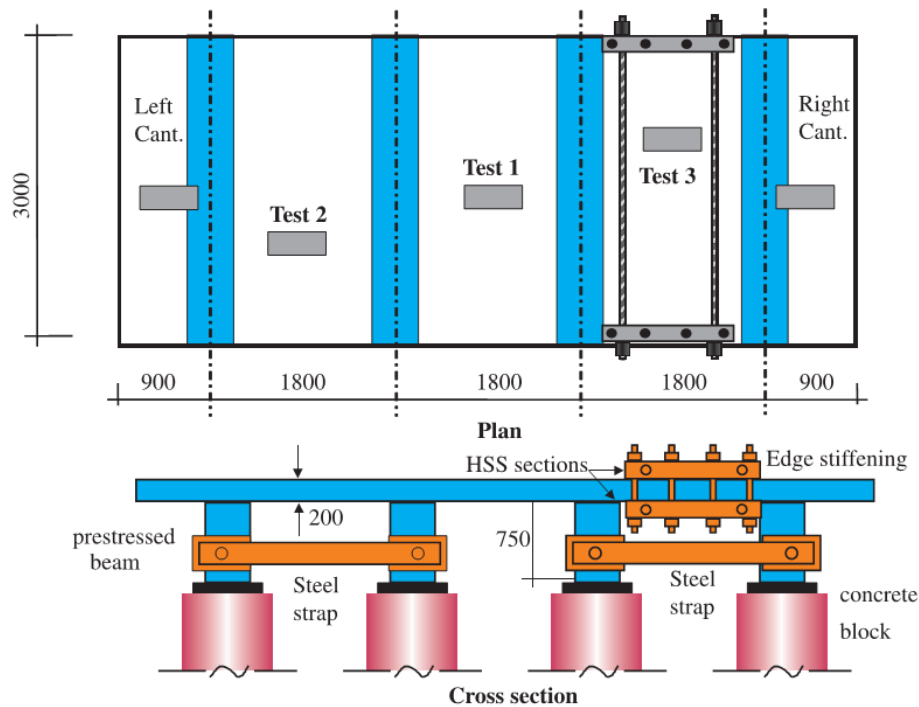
Full-scale bridge-deck panel (Hassan et al. 2000)
